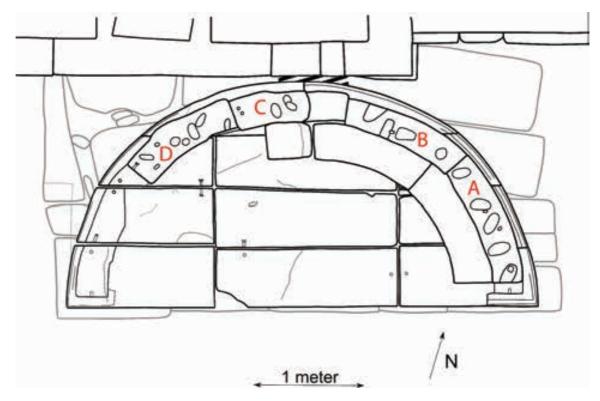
Plan of the exedra (in black) and its foundation (in grey).
